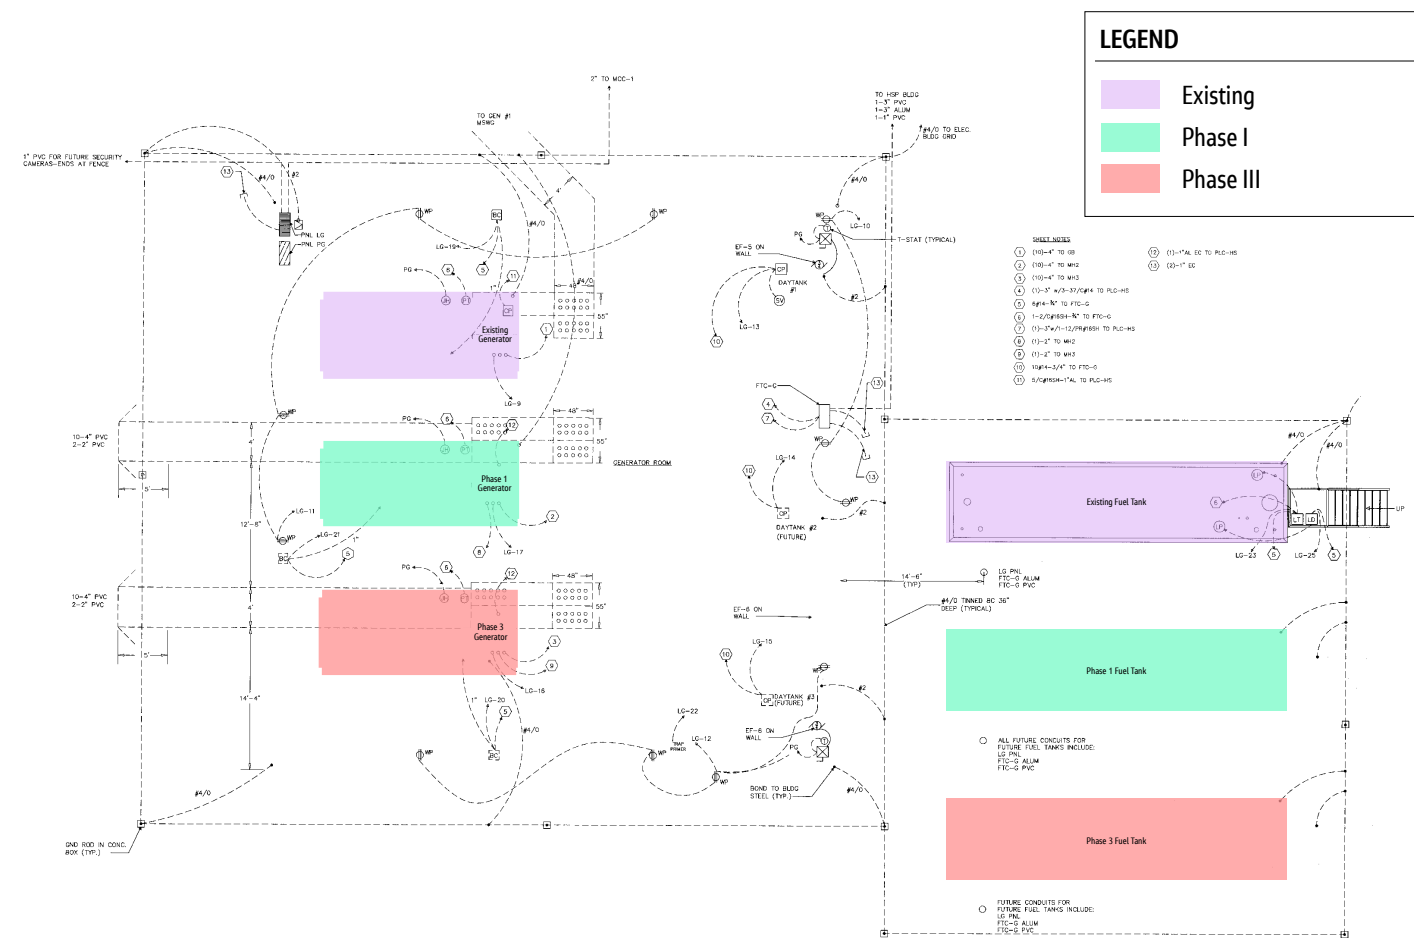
POST TREATMENT ELECTRICAL BUILDING PLAN
